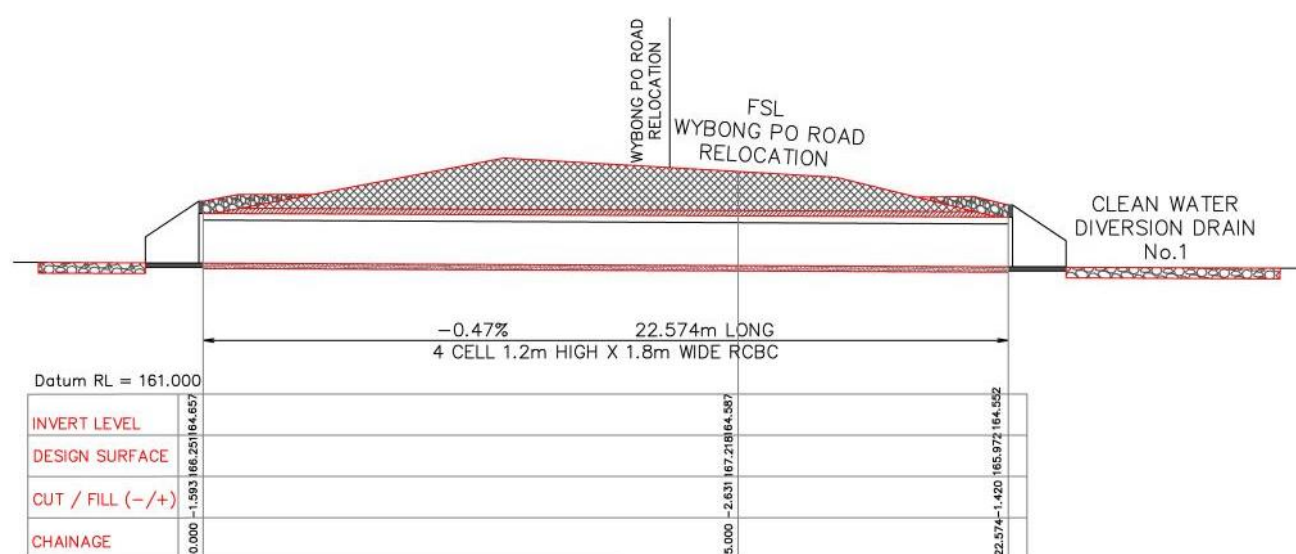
Wybong Post Office Road Conceptual Design Cross-Section at Culverts
